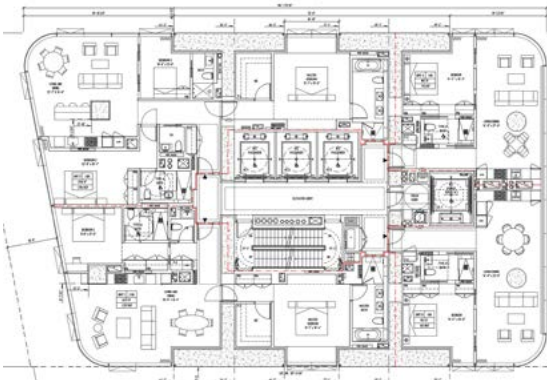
BUILDING ONE PLAN. © RAFAEL VIÑOLY ARCHITECTS
